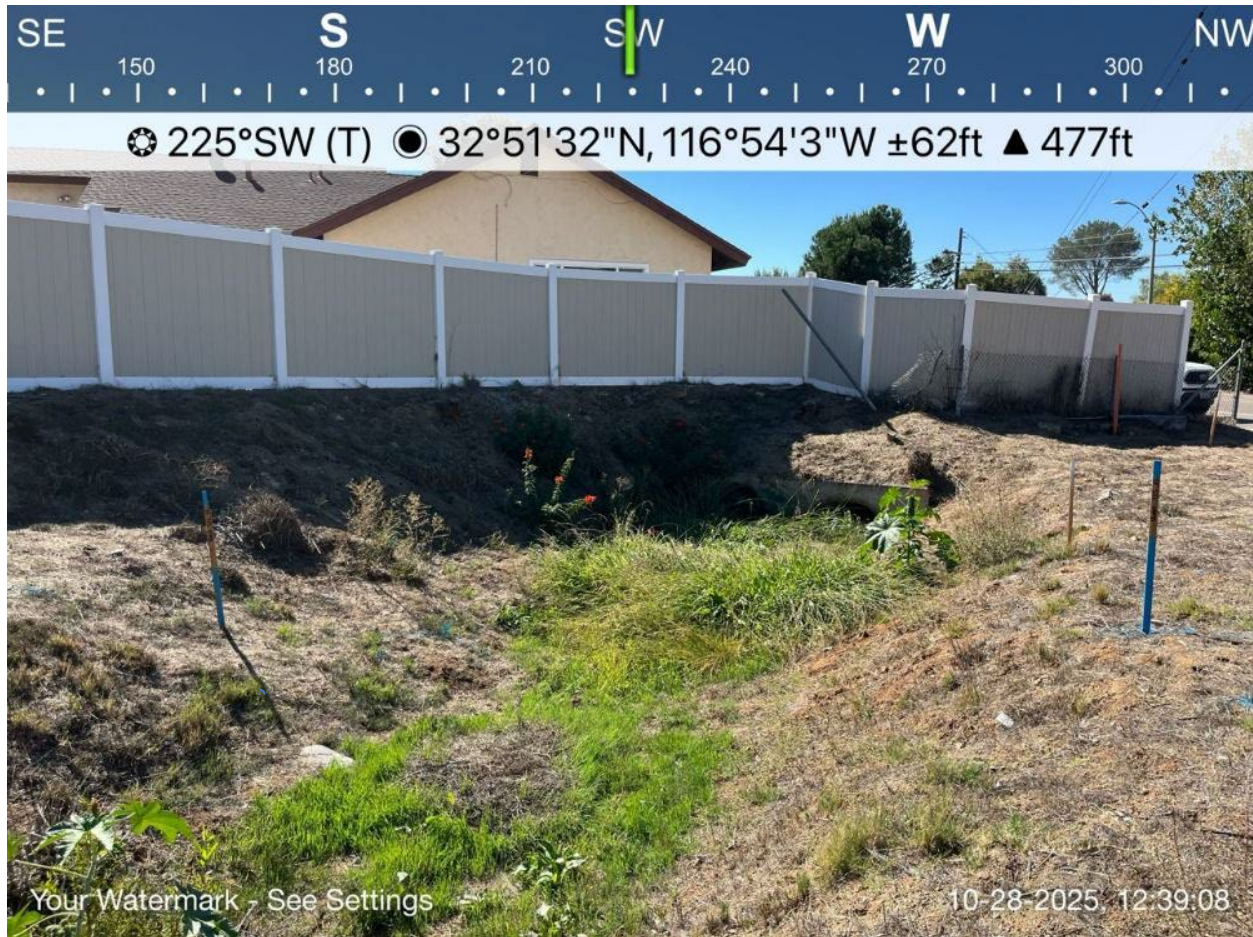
Adjacent to work location at 40+29, NWW-ALT-03 is a drainage feature with soil substrate. View facing southwest. October 28, 2025
